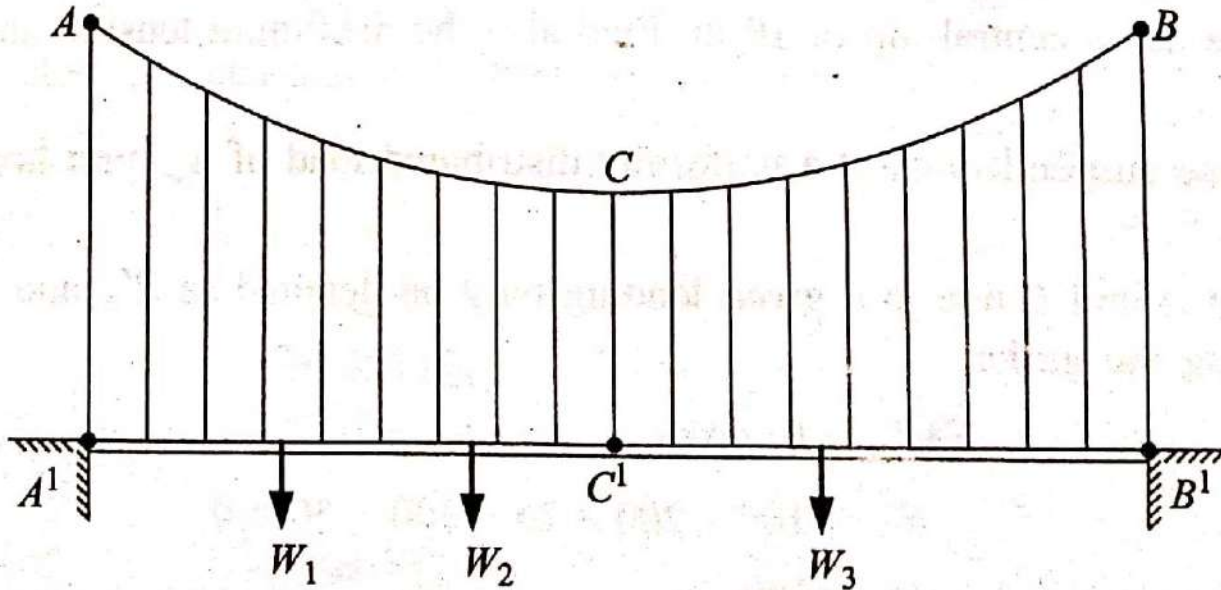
Typical suspension bridge with three-hinged stiffening girder
